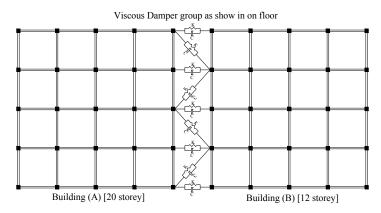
Typical plan of the two connected buildings (Special arrangement of link dampers)
